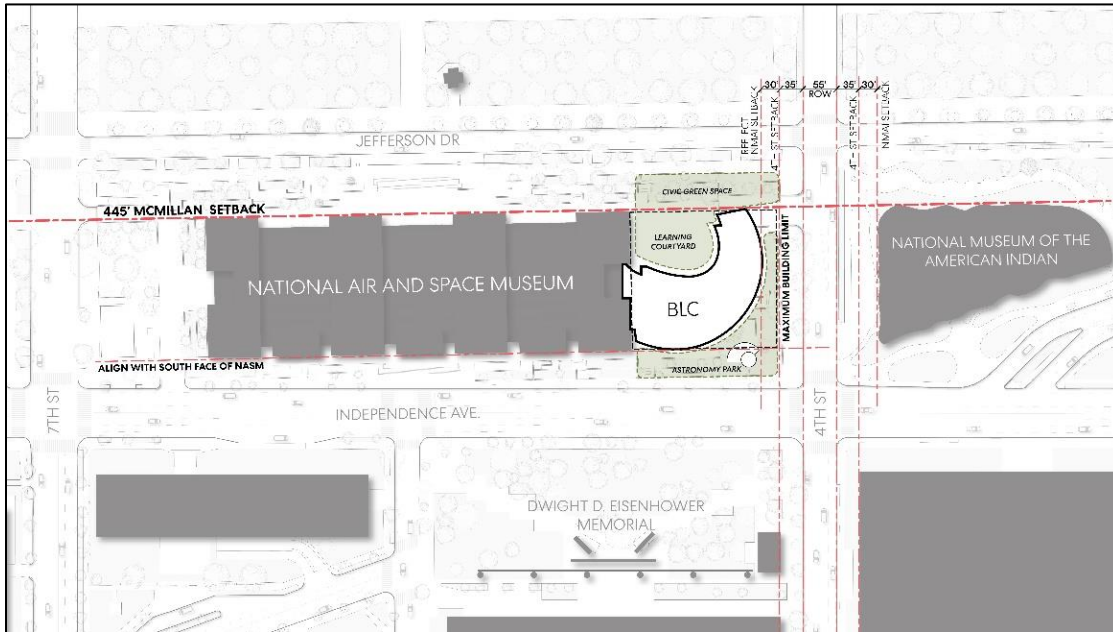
BLC setbacks from L'Enfant Plan streets, protecting viewsheds. (Perkins&Will, 2023)
